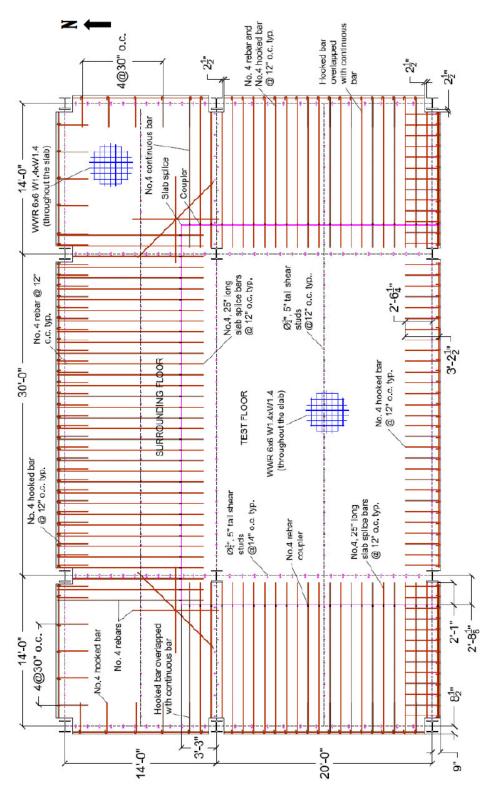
Steel reinforcement layout for the first floor of the CF1 Test. As the surrounding floor was not demolished between experiments, the steel reinforcement details shown here for the these locations were present at the time of the incident.
